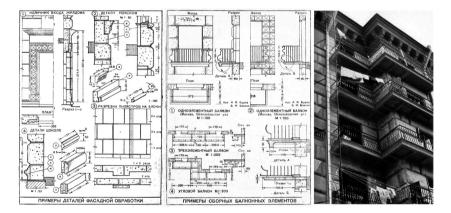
Residential building in Ulitsa Bolshaja Poljanka (A. Burov, B. Blokhin, 1939): decorative details, architectural elements and a view of the finished building [Dyurnbaum, 1946]. Source: Naum Dyurnbaum, *Structures of Civil Buildings (Конструкции гражданских зданий).* Moscow: Izdatel'stvo Akademii Arkhitektury SSSR, 1946, p. 283, 286, 287.
